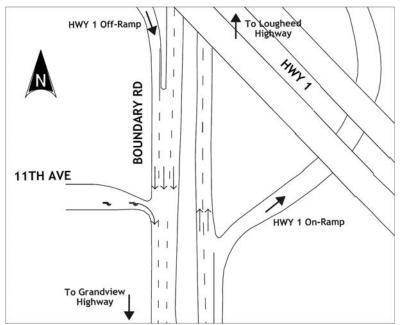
Boundary Road and 11th Avenue - Design Proposed in Survey
